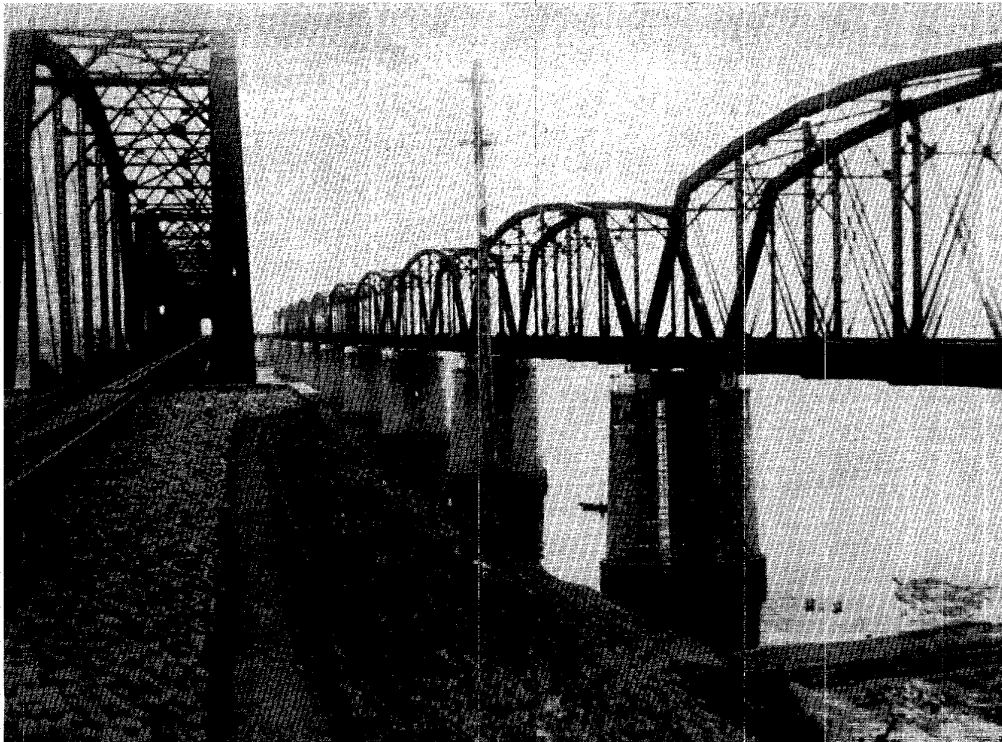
Han-gang at Kyongsong (Keijō)*. Duplicate single-track railroad bridges on main Kyongbu line. Now paralleled by double-track bridge.
